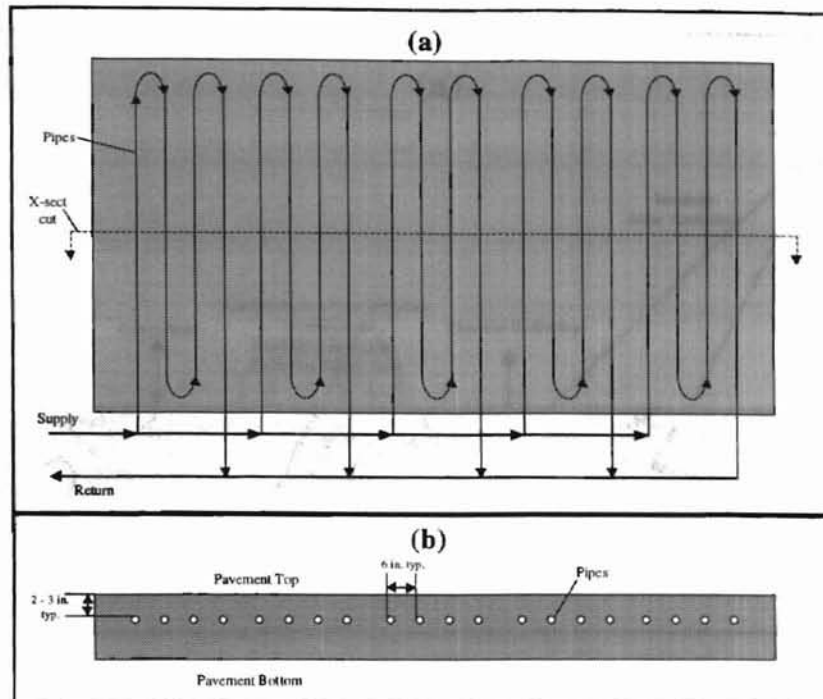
Serpentine pipe configuration in a hydronically-heated pavement slab in (a) plan view and (b) cross-sectional view.
